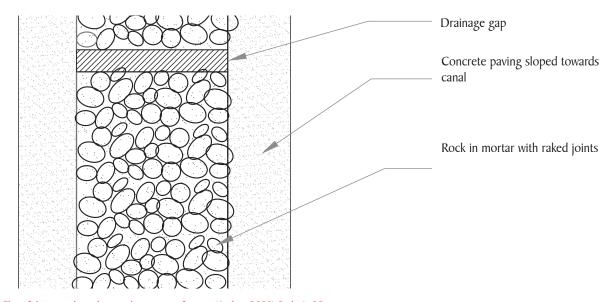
Plan of drainage channels toward stormwater feature. (Author, 2008) Scale 1: 25
